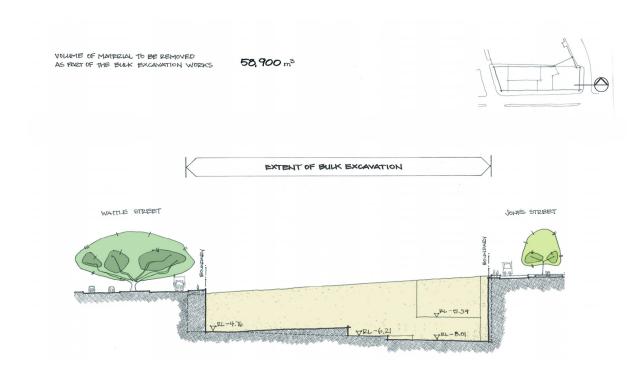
Section of bulk excavation at Broadway (Source: DCM)
